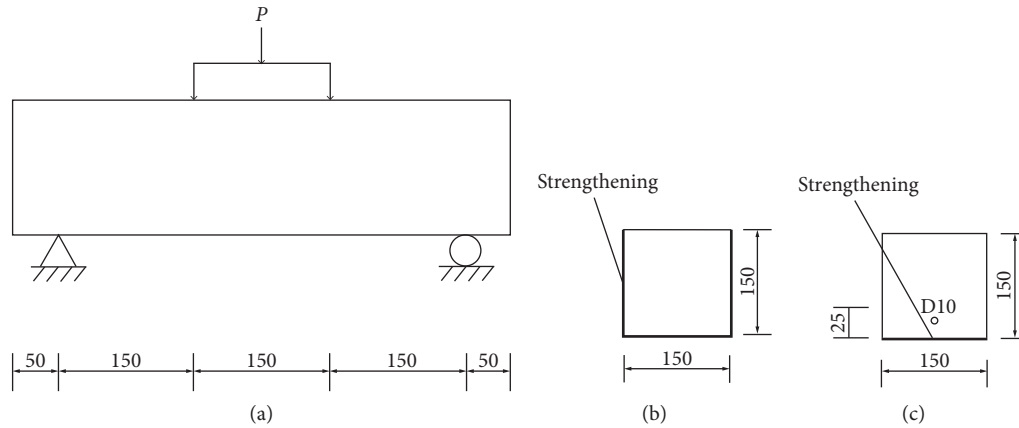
(a) Experiment of coated beam (unit: mm) of specimen under two-point loading, (b) strengthening at three faces without reinforcing bar, and (c) strengthening at a single face with reinforcing bar.
